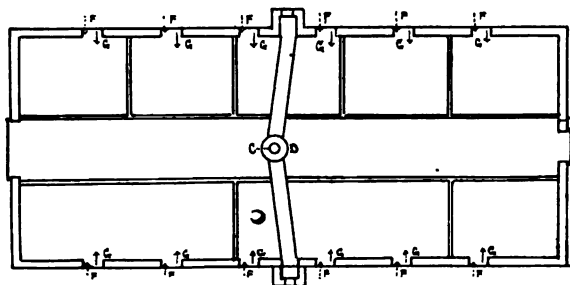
PLAN OF COW STABLE AT EXPERIMENT STATION, MADISON, WIS., SHOWING LOCATION OF AIR DUCTS.
